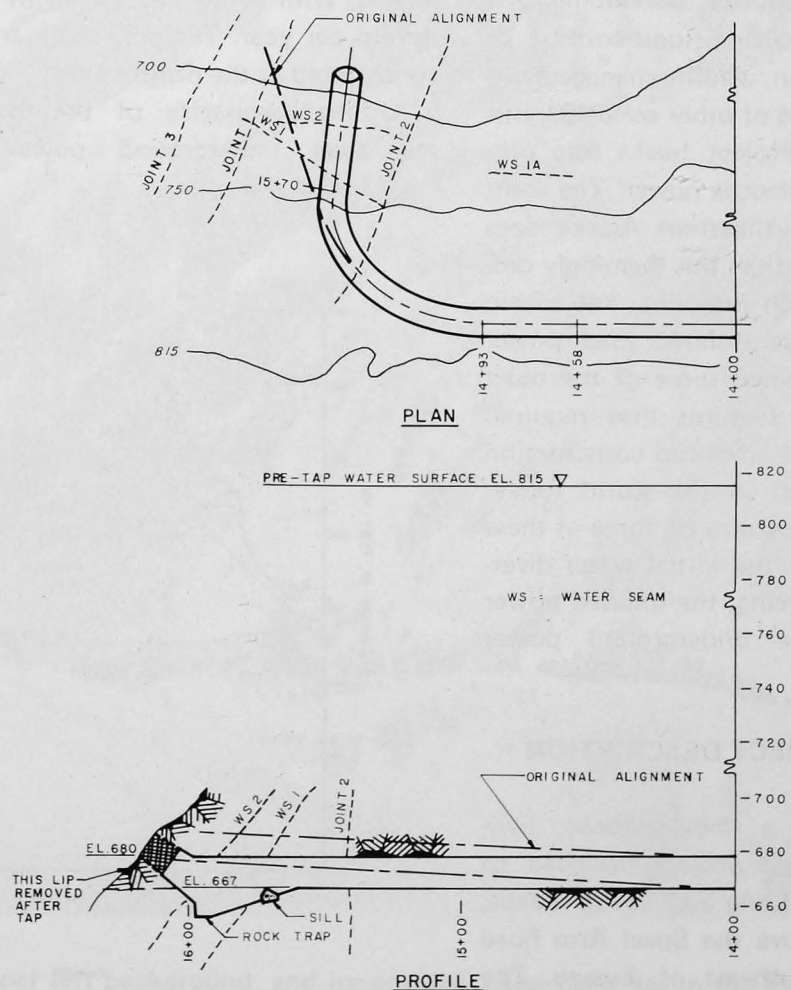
LAKE TAP - FINAL PLAN AND PROFILE
